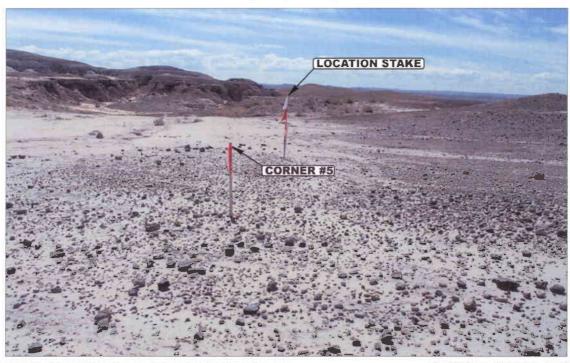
PHOTO: VIEW FROM CORNER #5 TO LOCATION STAKE
